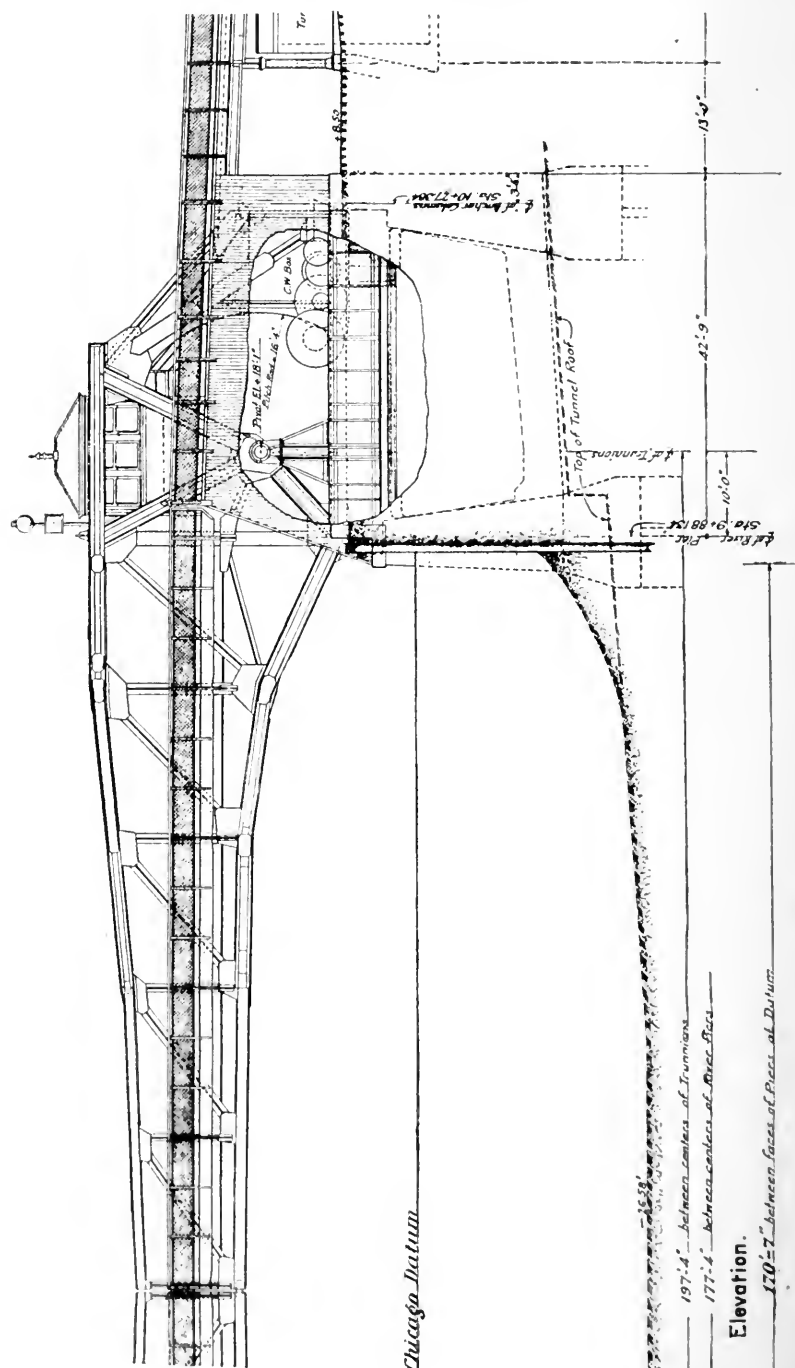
Part of Washington Street Trunnion Bascule Bridge, Chicago.
